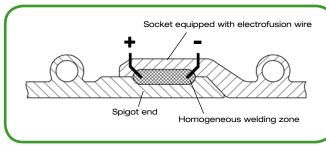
PKS $^{\circ}$  pipe welding zone
